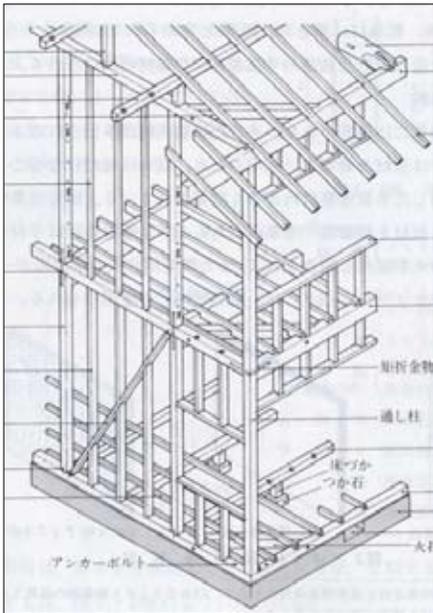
Post-and-beam construction in Japan with diagonal bracing (WHE Report 86)
